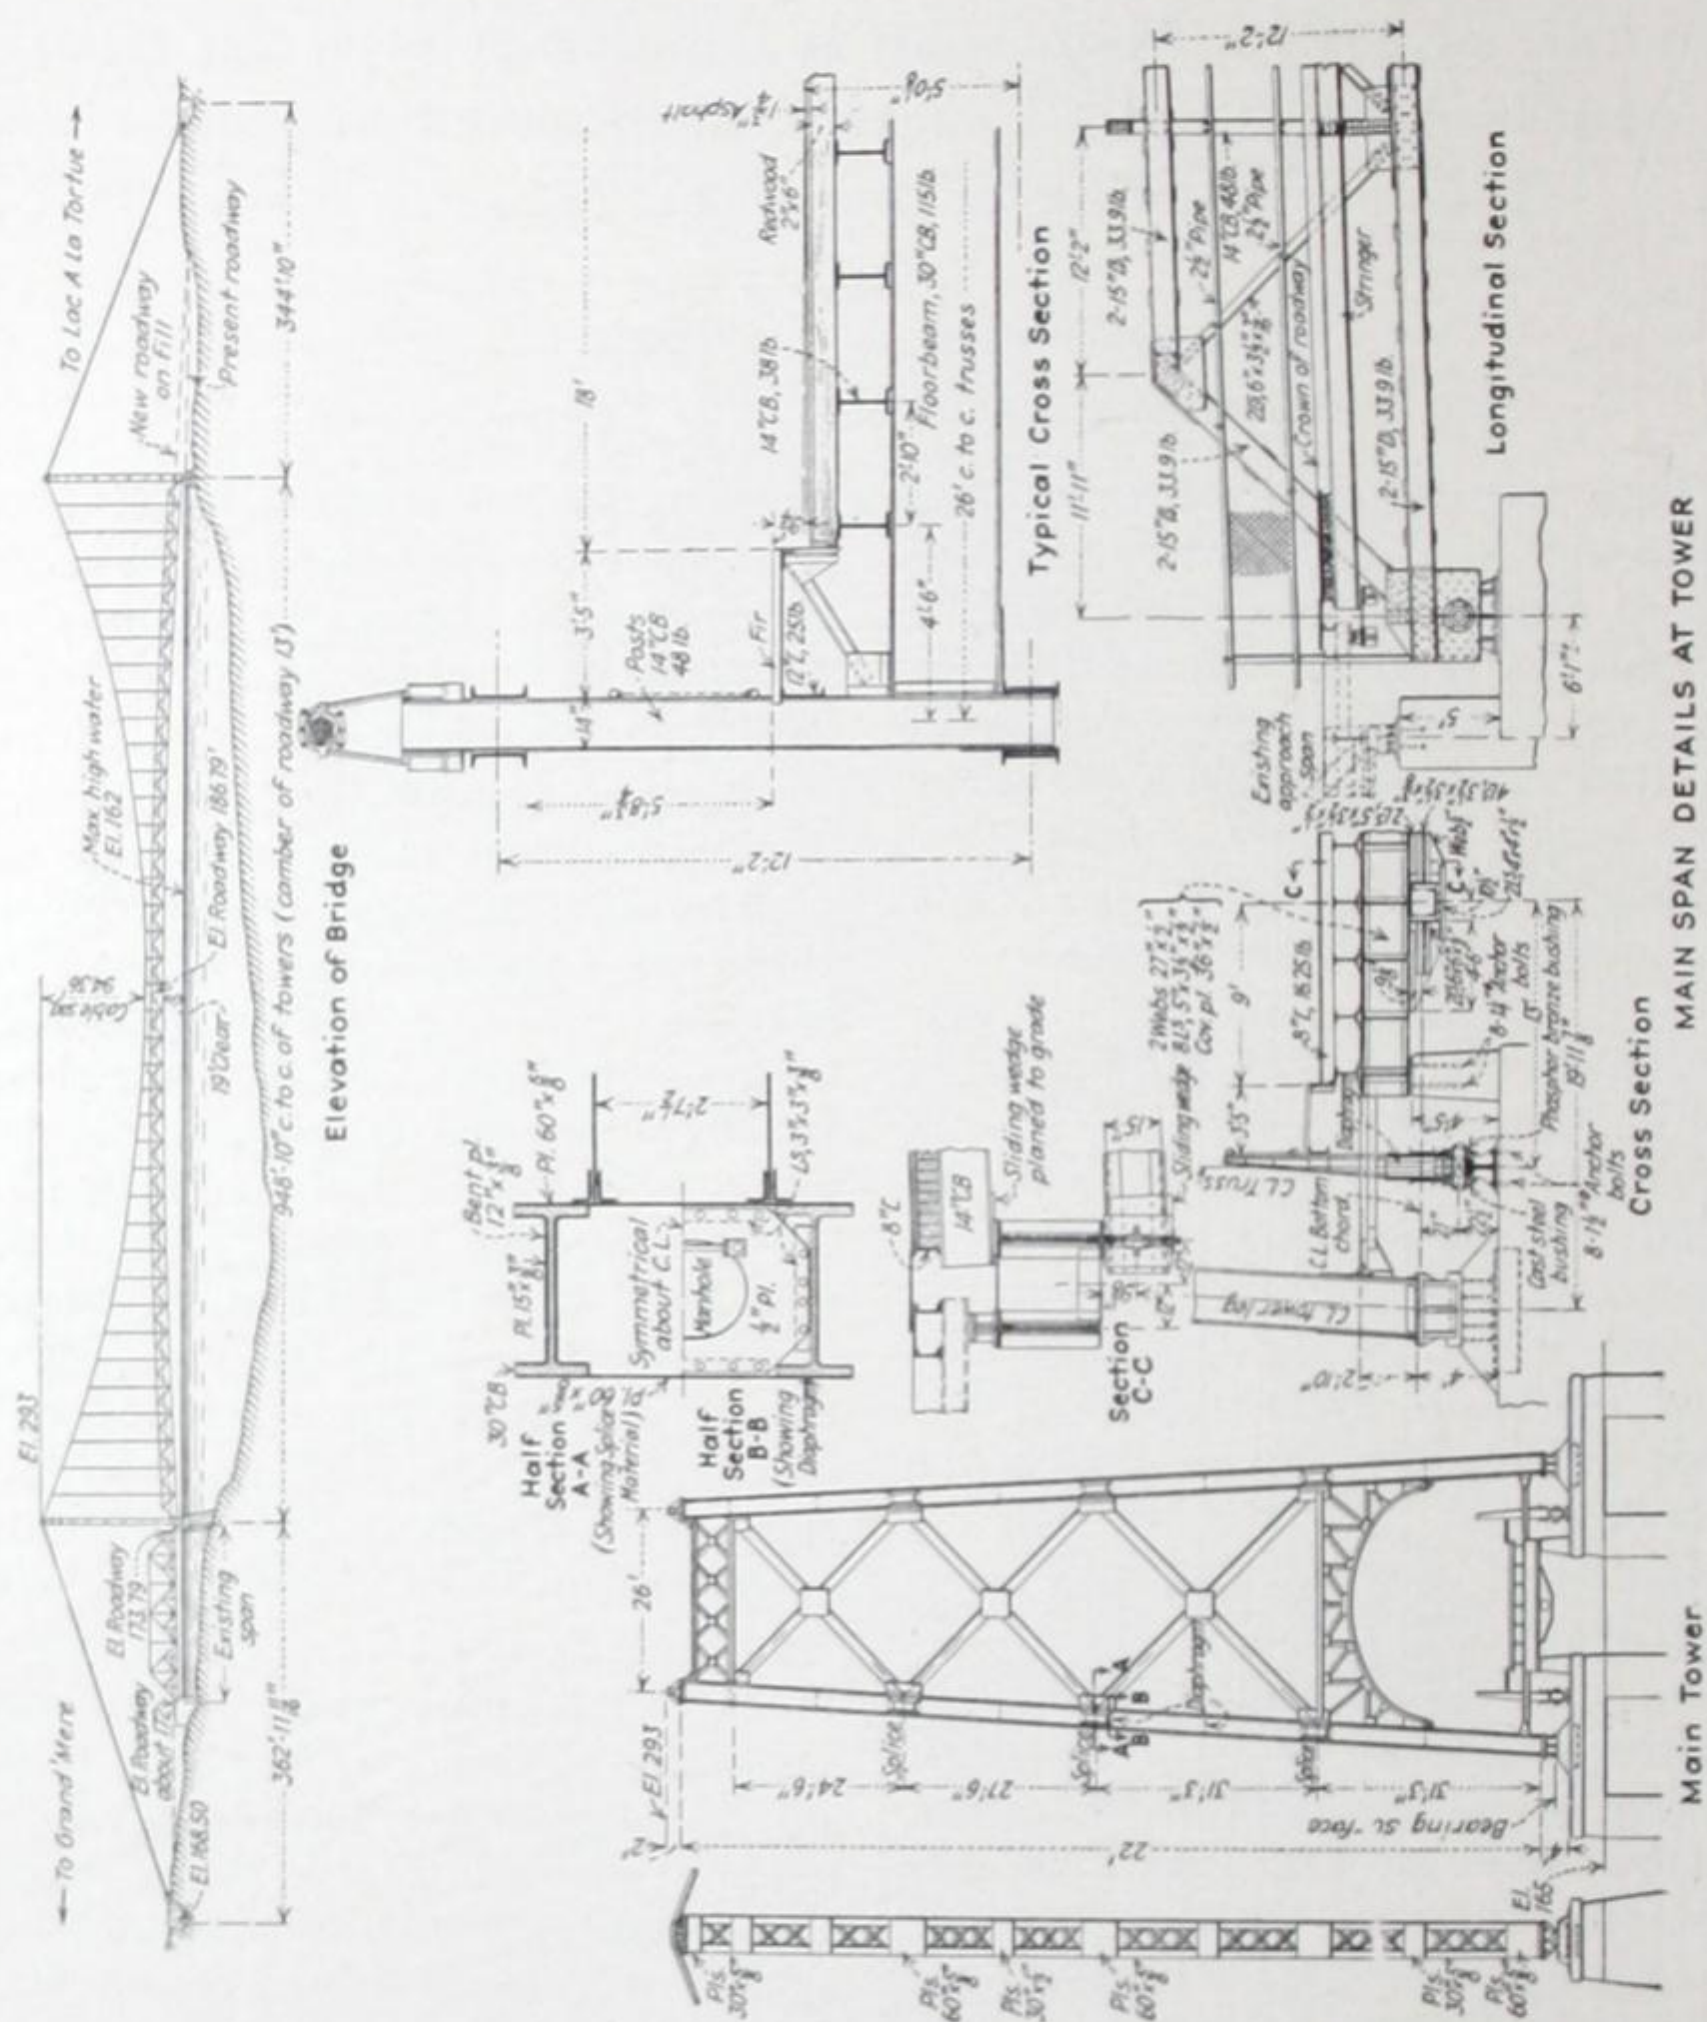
Details of Long Span Rope-Strand Cable Suspension Bridge
